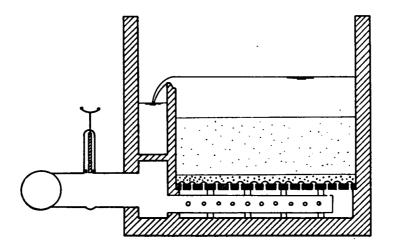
False bottom and strainer underdrainage system for backwashing with water
